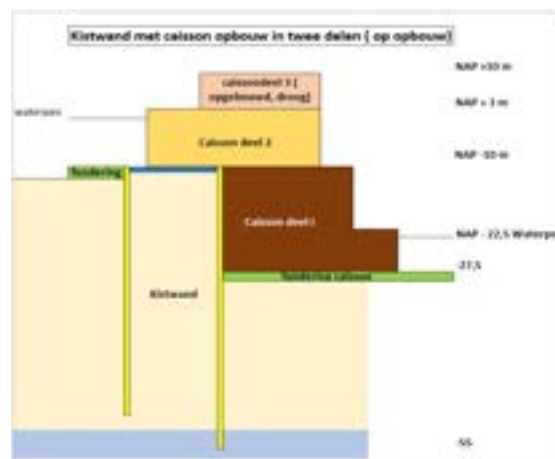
Construction sequence for the caissons (Lavooij, 2018)
